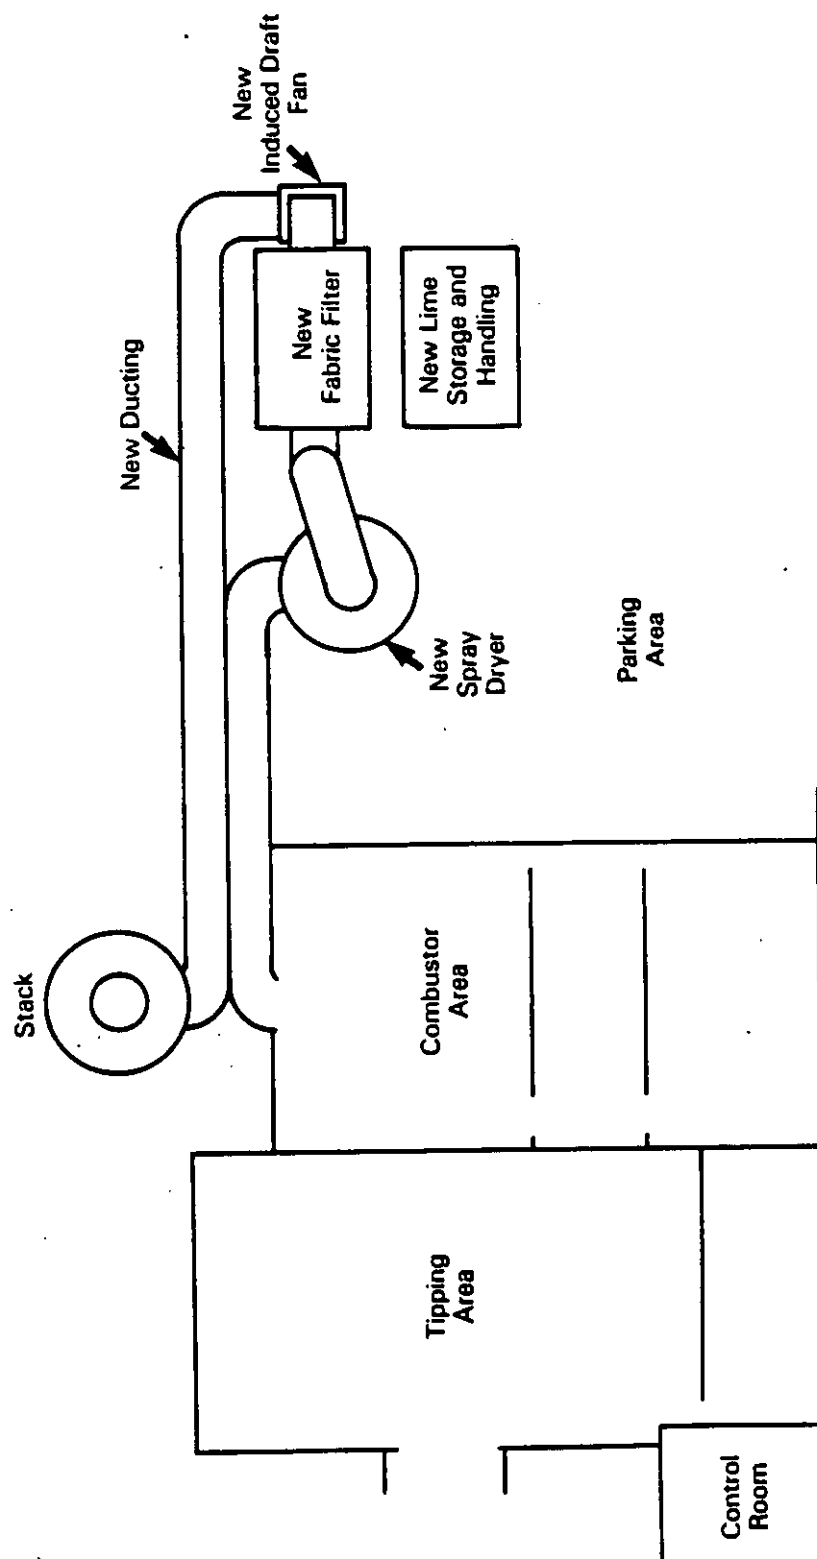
Plot Plan of Spray Dryer/Fabric Filter Equipment Arrangement.
